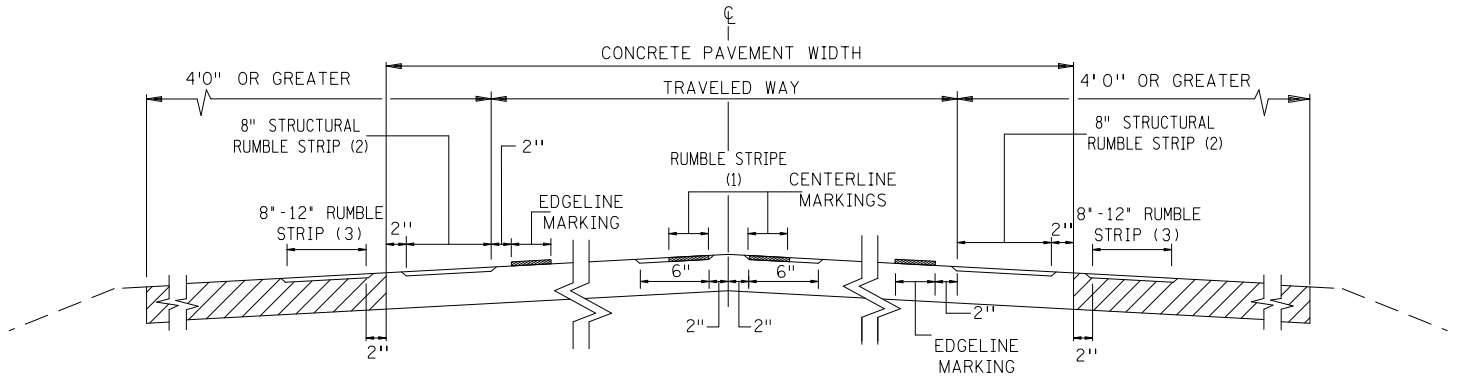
B - CONCRETE PAVEMENT OPTION 2
